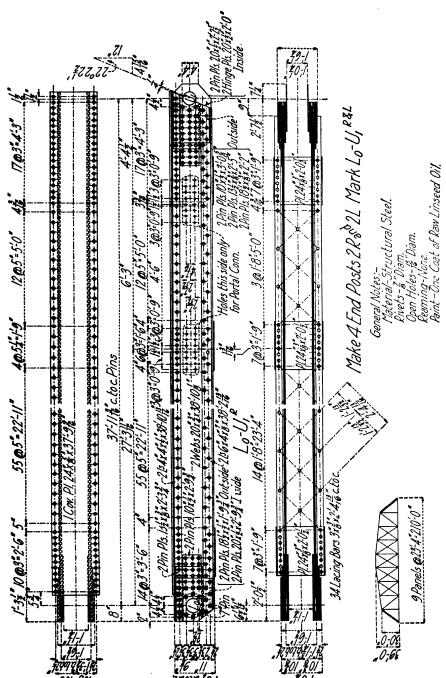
SHOP DETAILS OF END-POST OF A TRUSS BRIDGE.
